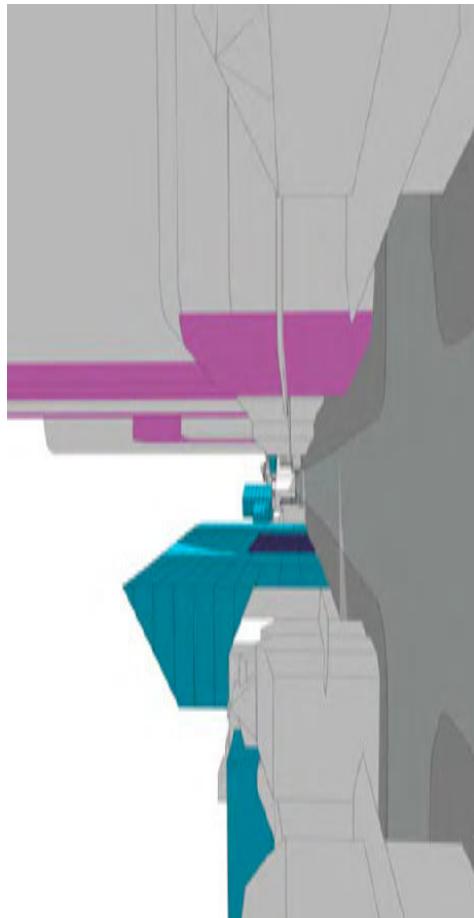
View 1 - northward, Corner Buckland Street and Botany Road looking toward Waterloo Metro Quarter
